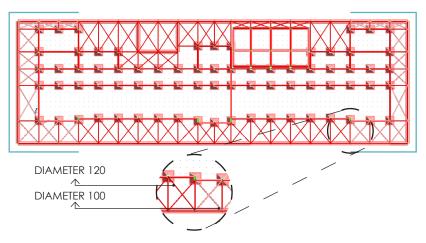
CDs WIN 3D model typical floor plan | Version 3
